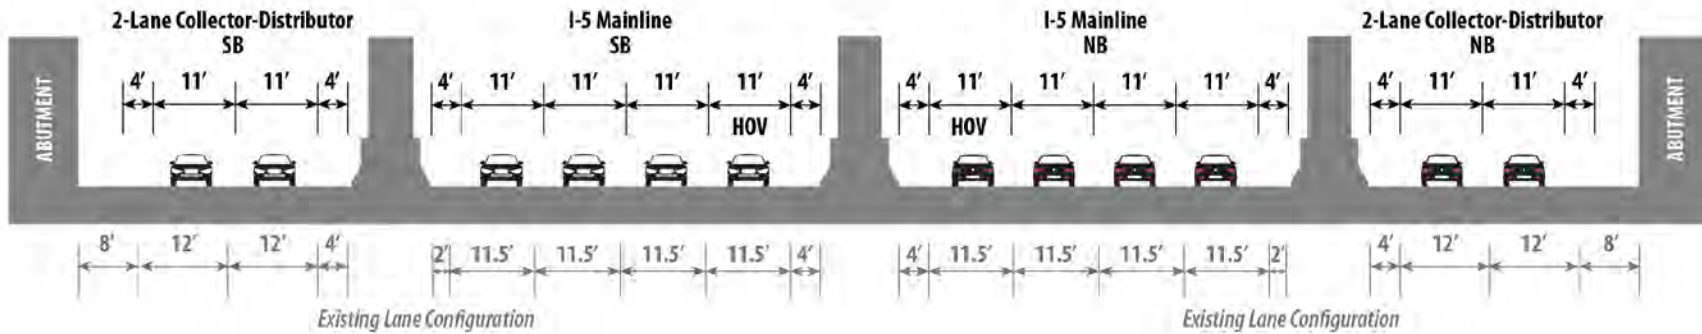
I-5 Practical Design Cross Sections – Collector-Distributor at S 72nd Street & S 56th Street Bridges
